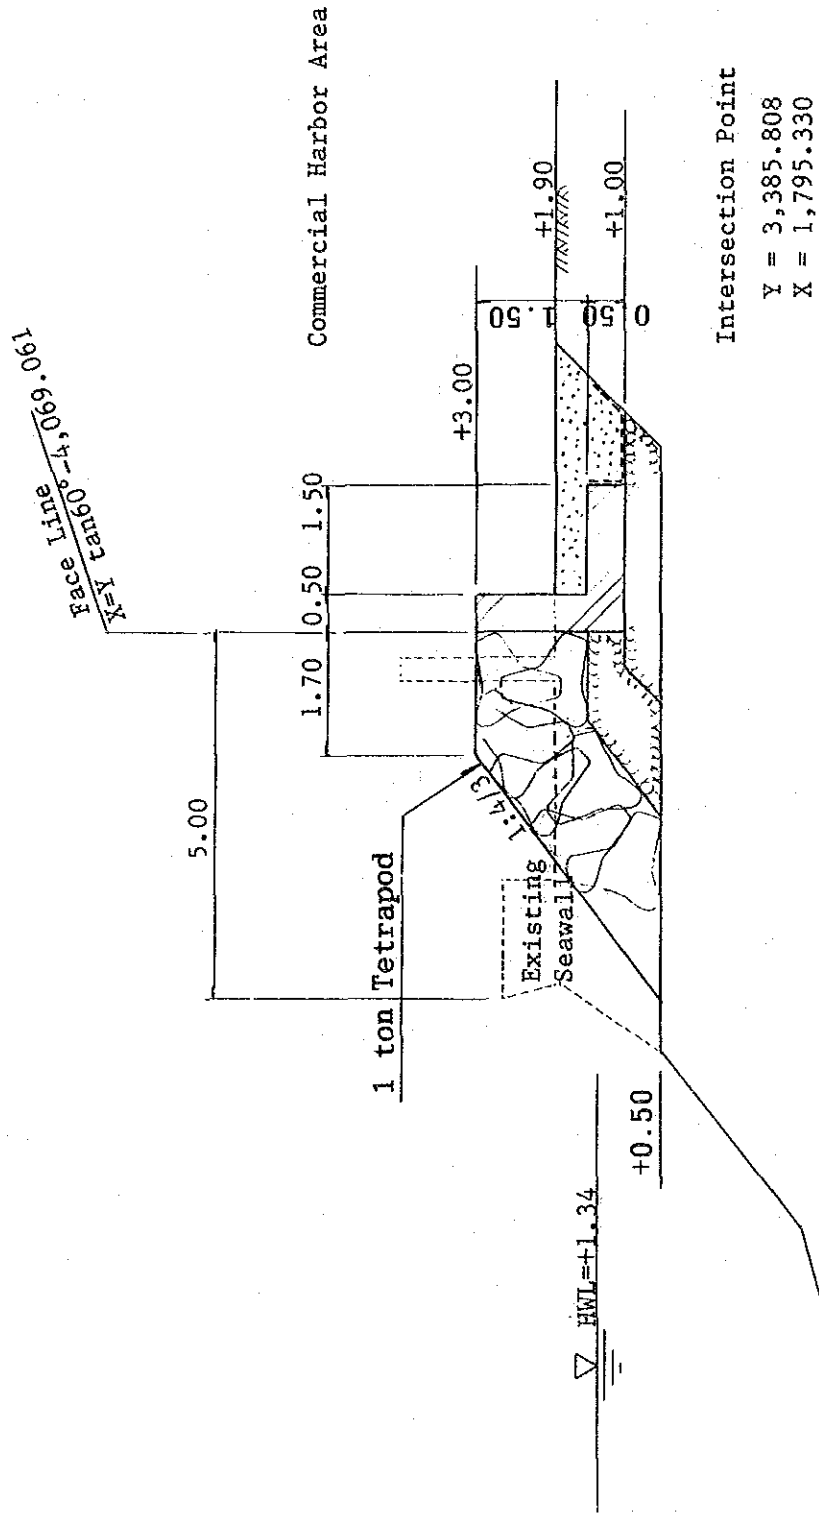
Typical Section of West Coast : North Seawall (S=1:100)
